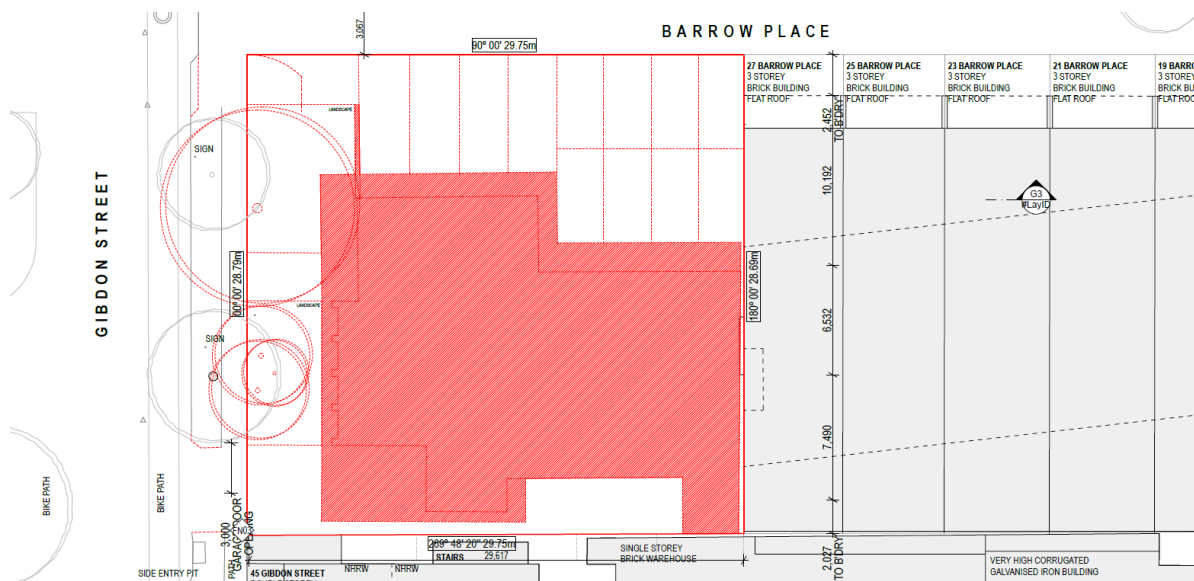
Existing conditions of the subject site (applicant submission, December 2020)
